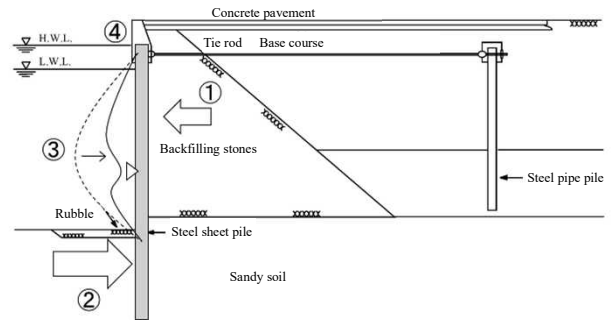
Stability improvement mechanism for a sheet-pile quaywall (when applying an improvement method that uses an existing structure)
